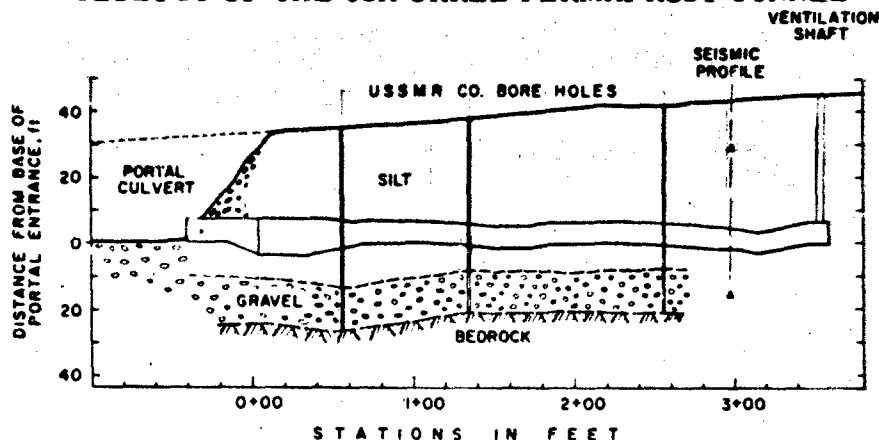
Tunnel site section. Depth to gravel and bedrock based on USSMR Co. bore hole records.
